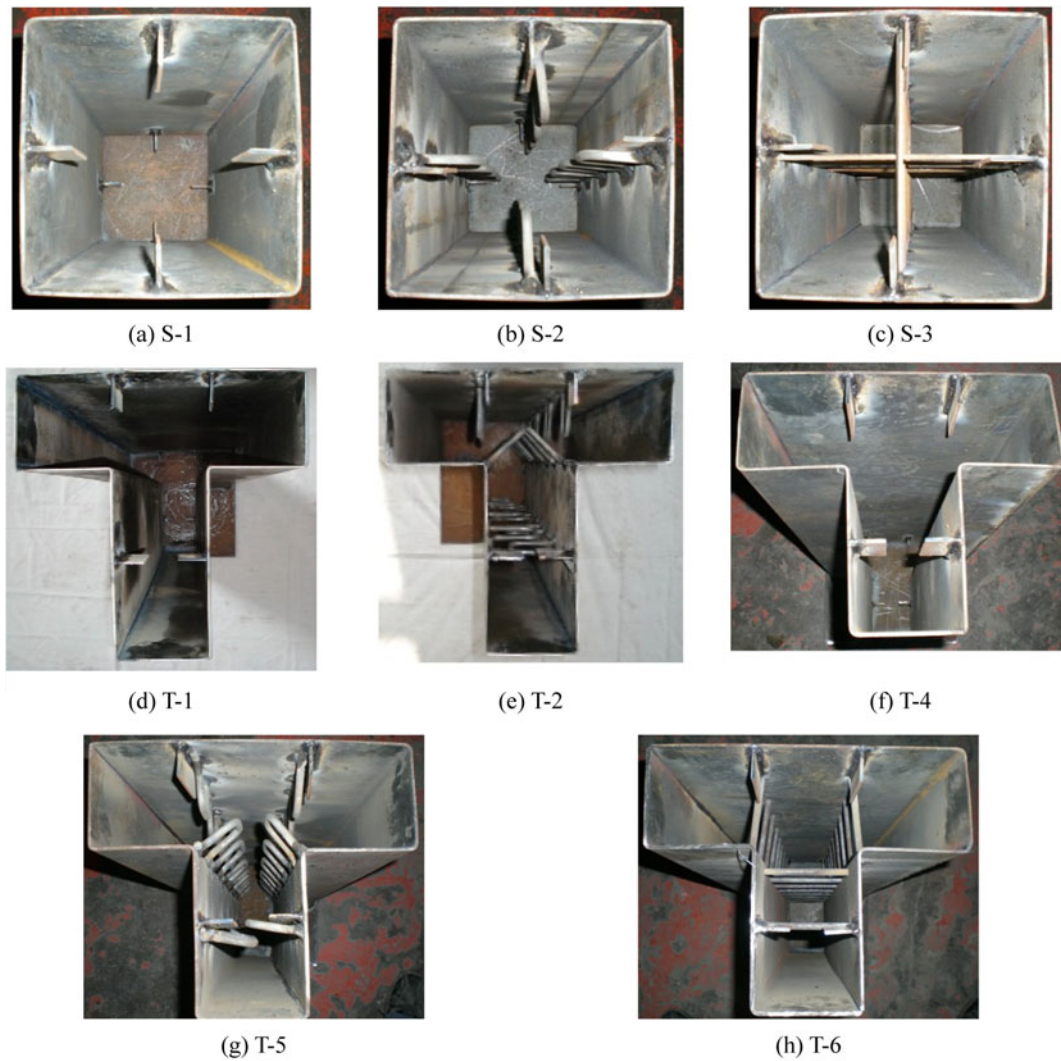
Cross sections of hollow steel tubes with stiffeners.
